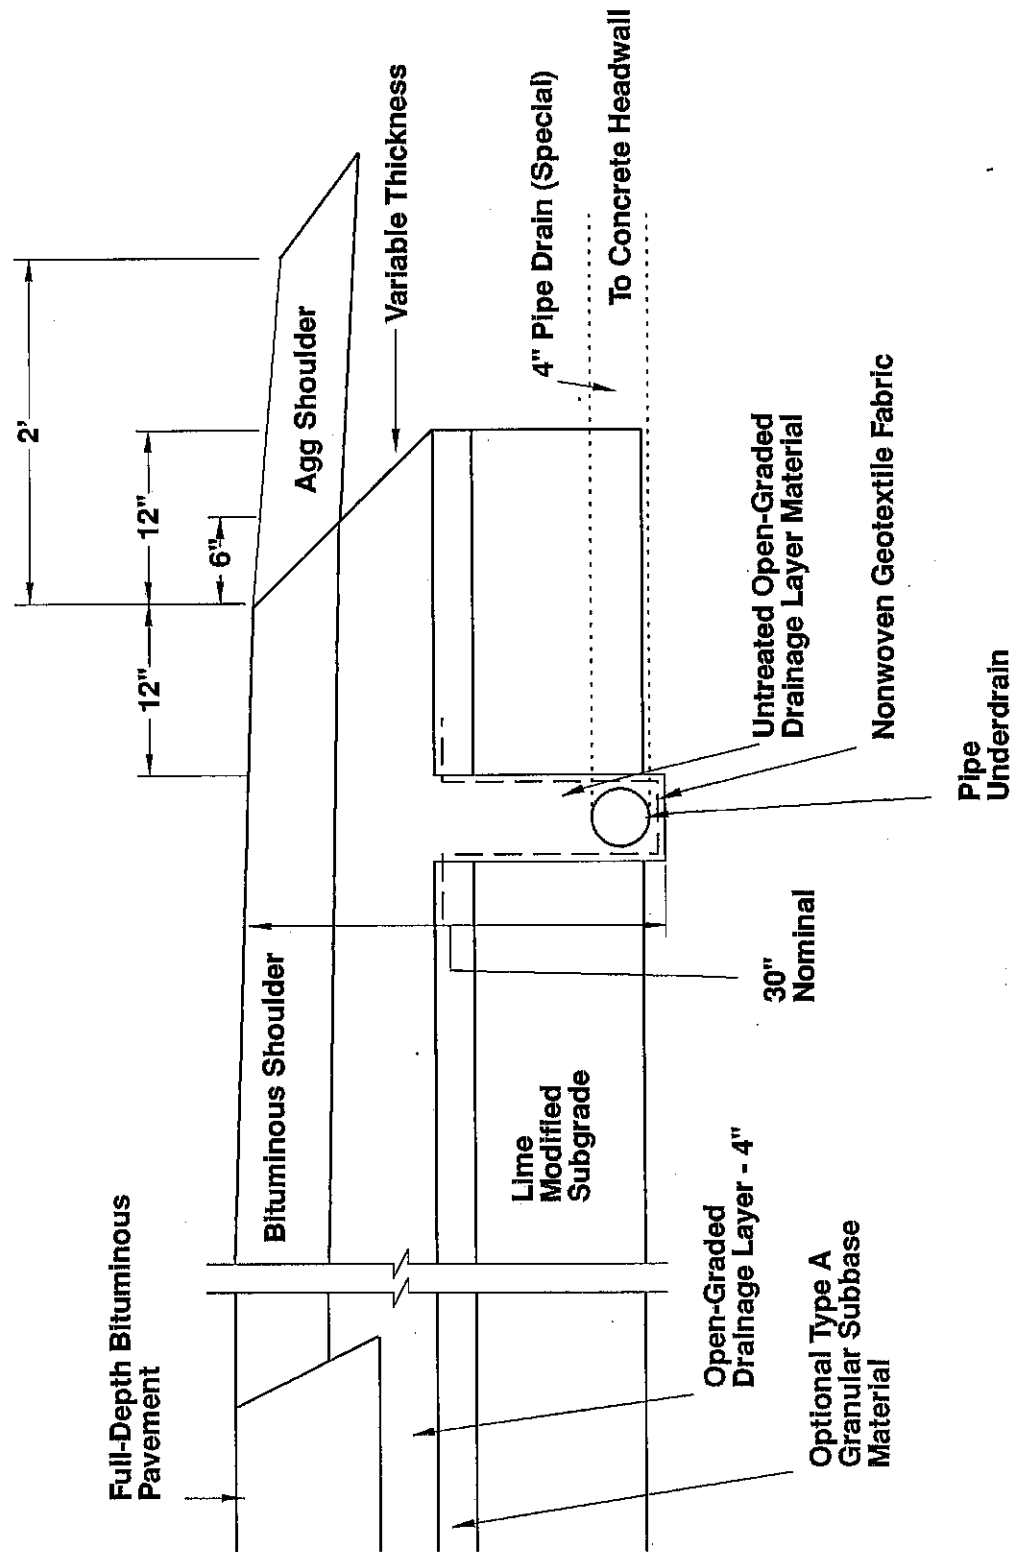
Full-Depth AC Shoulder Detail for Drainage Layers
